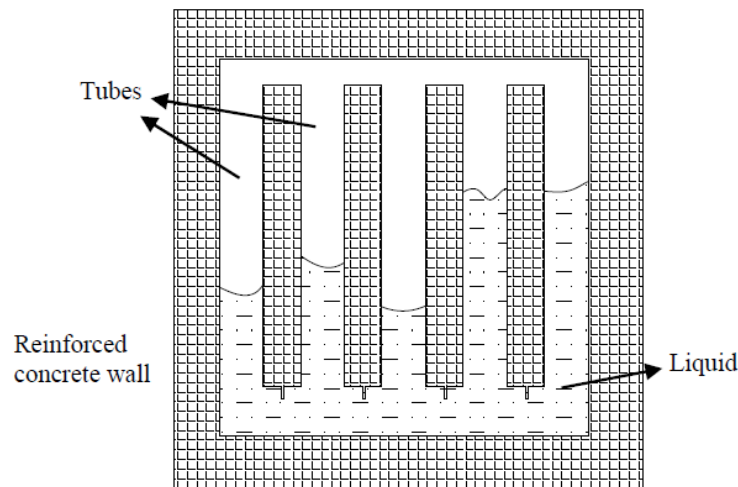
Tuned liquid wall damper. Source: Wu et al. (2017).
